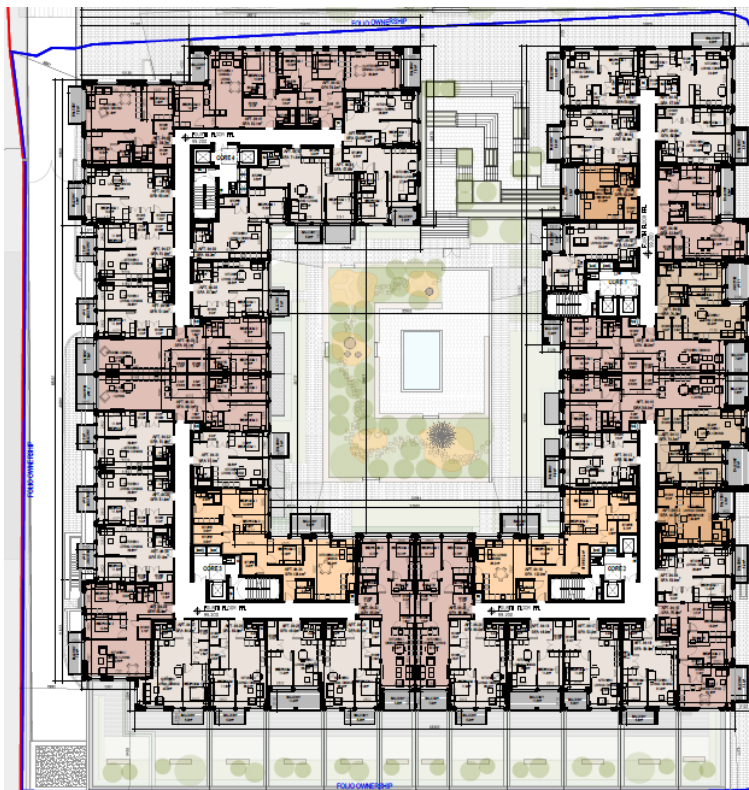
Fourth floor plan. 2 no. studio apartments, 27 no. one-bedroom apartments, 14 no. two-bedroom apartments and 2 no. three-bedroom apartments are provided at this level.
